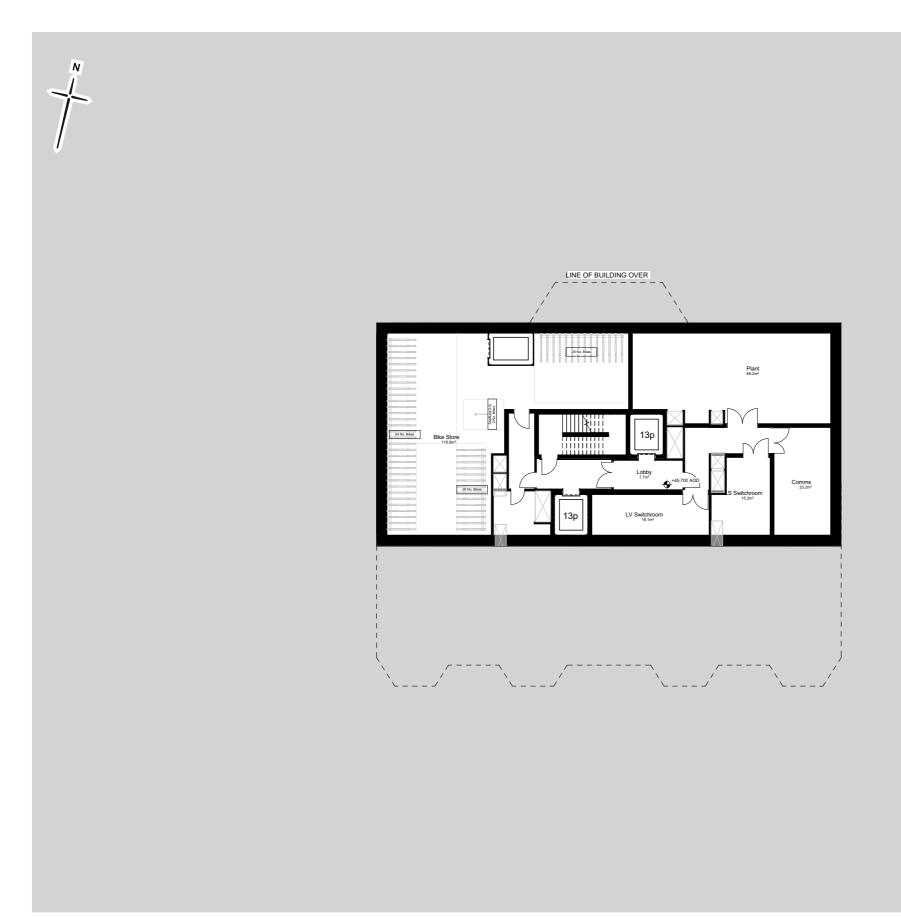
Current S73 revised scheme proposed basement plan N3E (GRID Architects, proj. 22036, dwg no. PL110099, scale 1:100@A1, draft, date 13/01/25)
